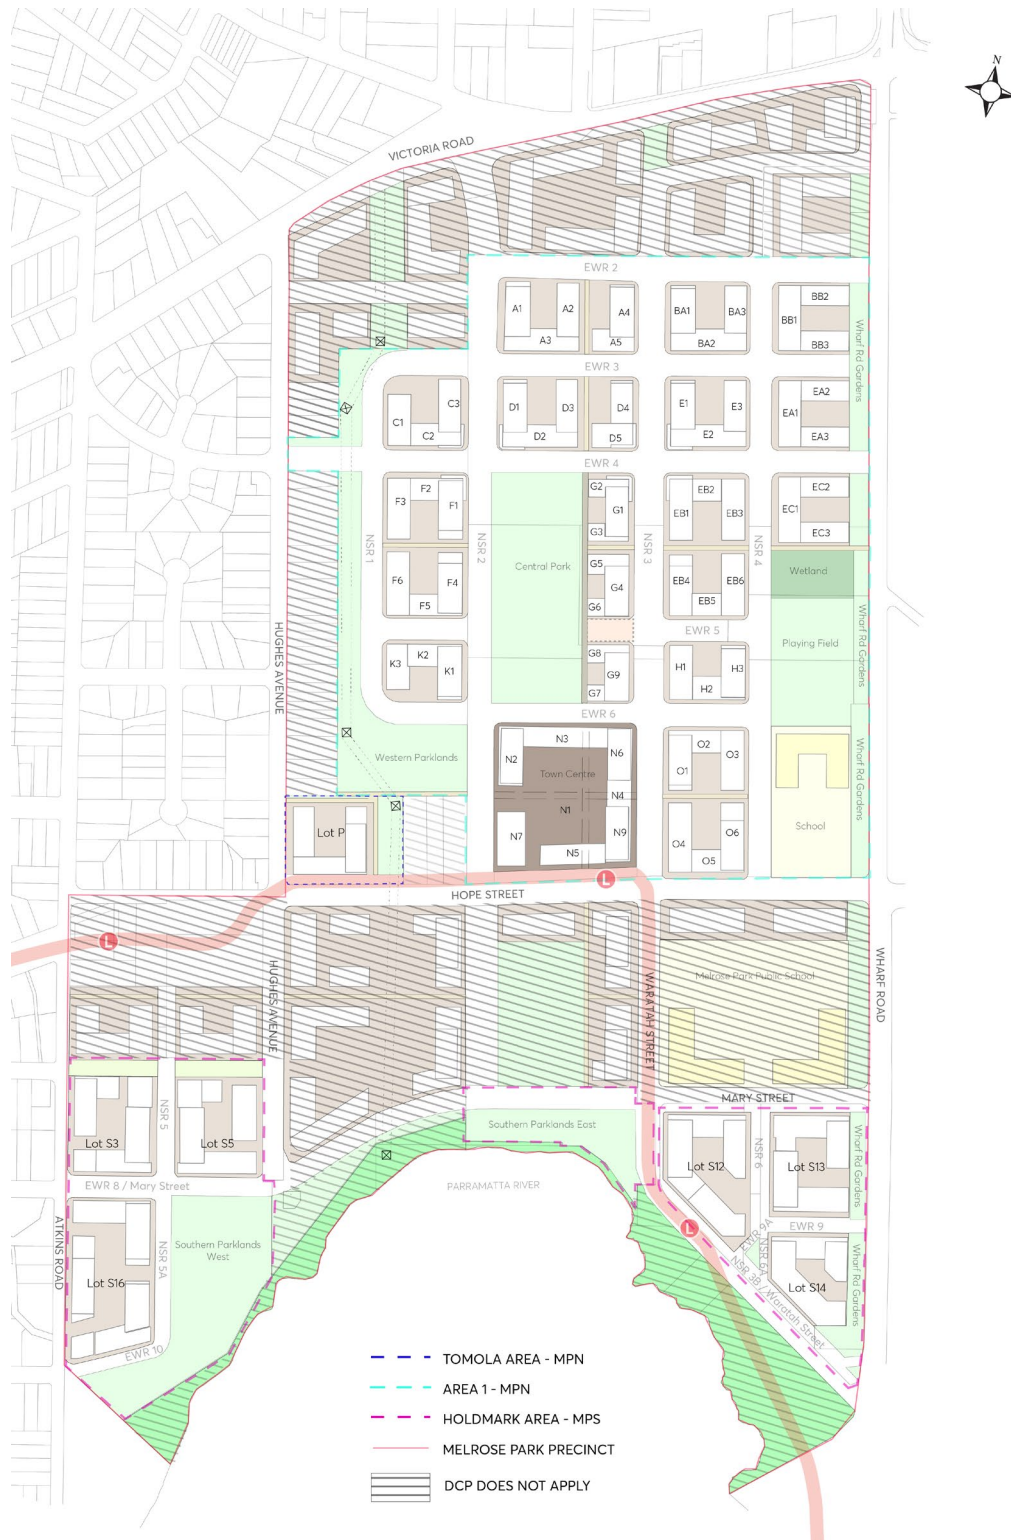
Melrose Park Masterplan
